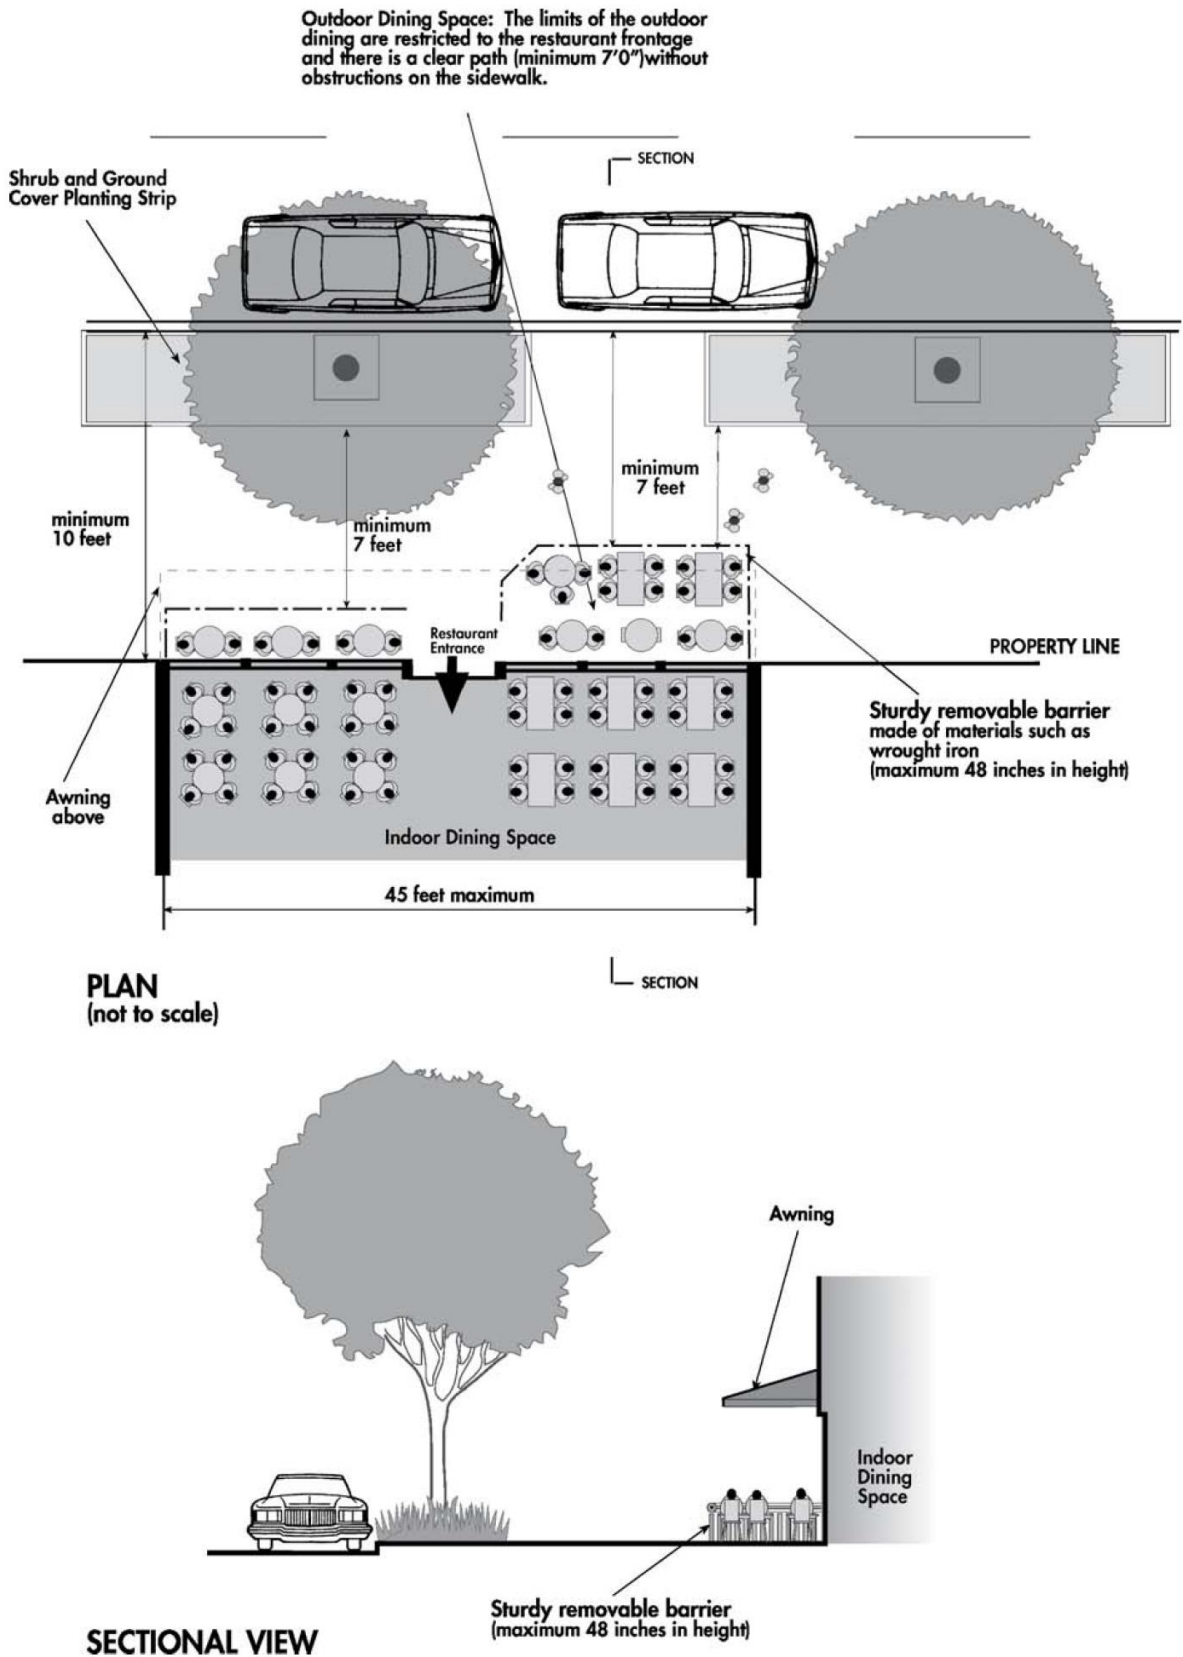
Typical Layout of Outdoor Dining Spaces
